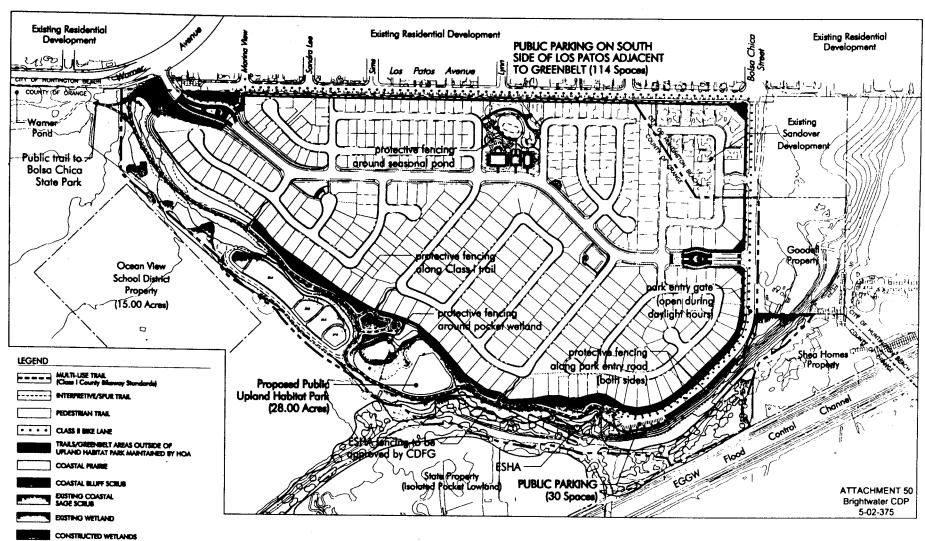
Location Map BRIGHTWATER AREA 3A-1 AND 3B SITE PLAN
